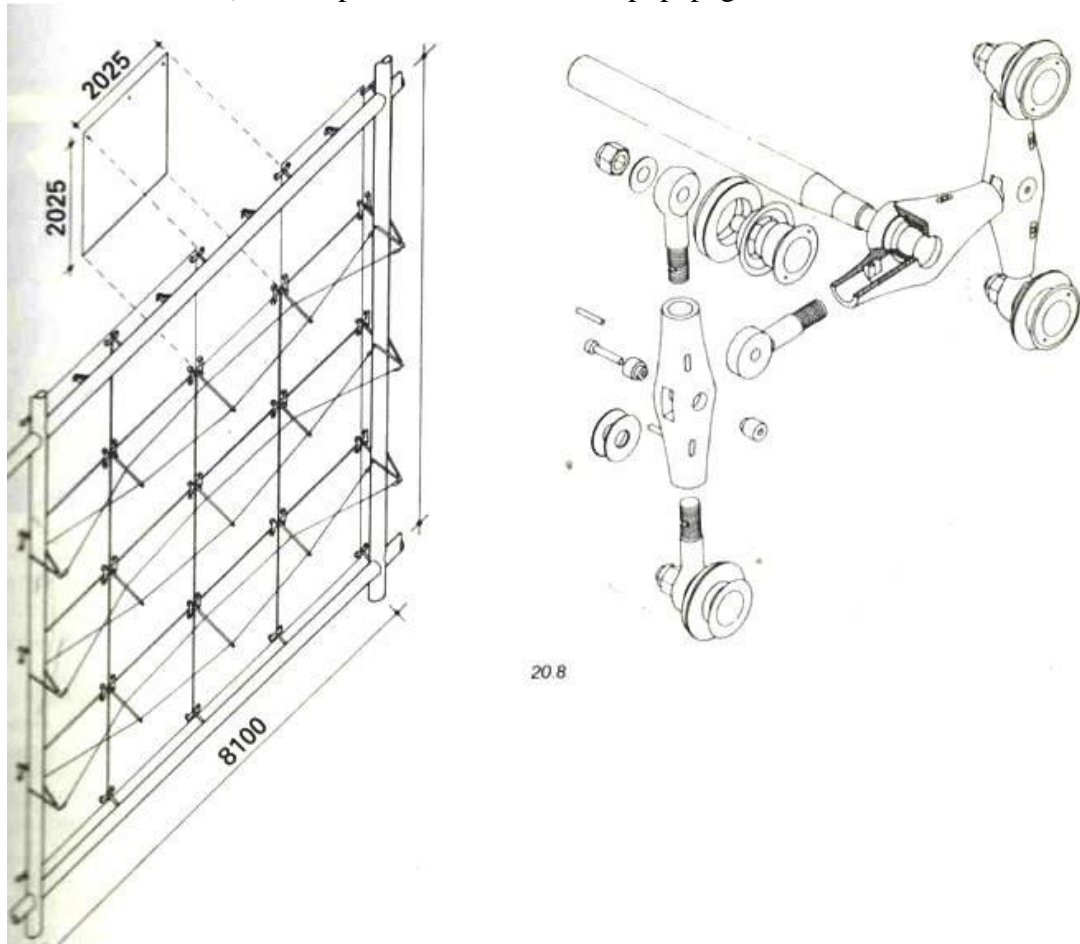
Detail of cross bracing in glass curtain wall facade and connection type used for Parc de La Villette (Alan,B., and Chris, G, 1996)
